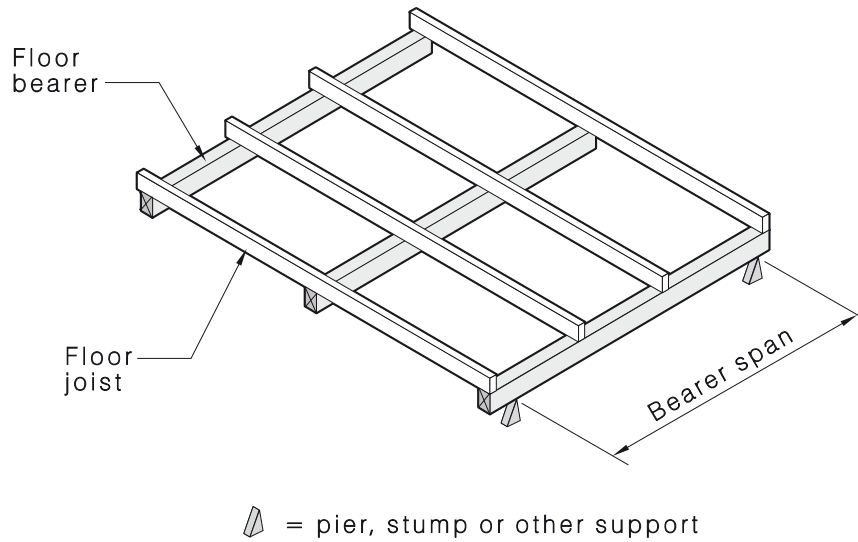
BEARERS SUPPORTING FLOOR LOADS ONLY (40 kg/m<sup>2</sup>)
